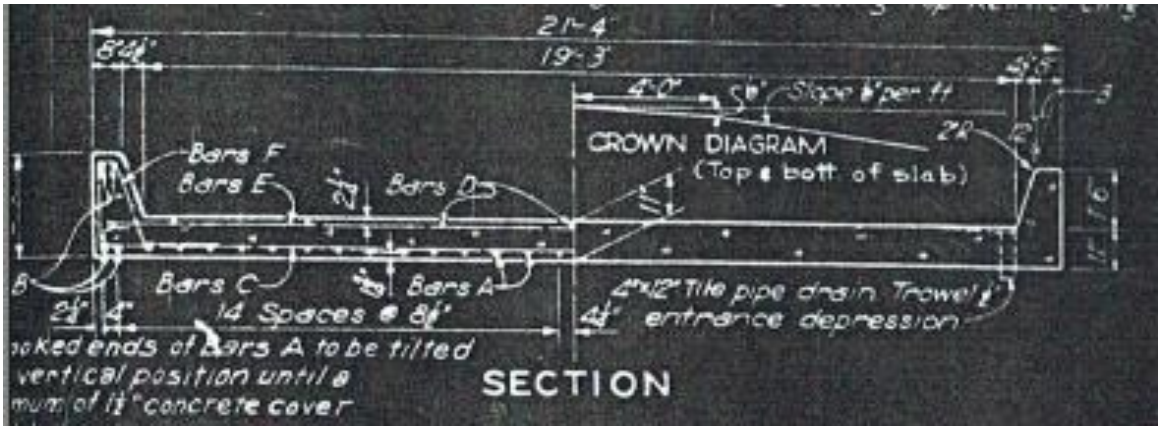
Bridge CS-9 Transverse Section (TxDOT 2018a)
